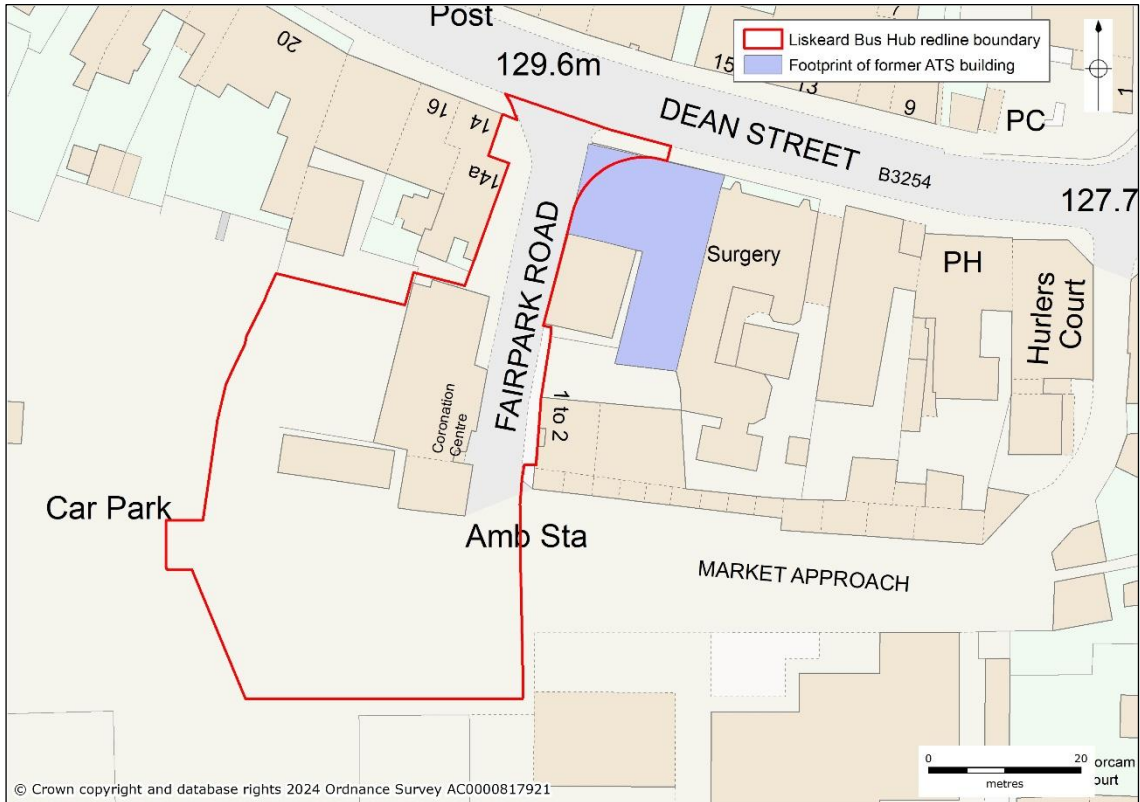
Site extent of proposed new bus hub, with the location of the ATS building shaded in lilac.
